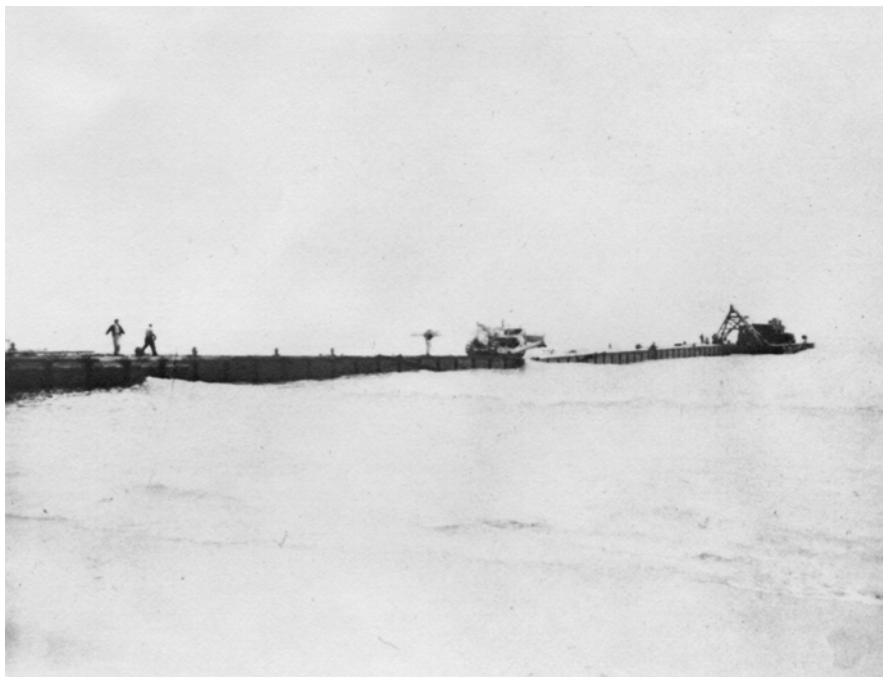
Testing the end-to-end connection in 5-ft surf with a D-8 tractor.
